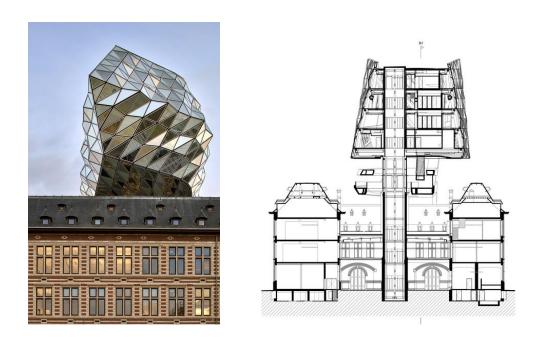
Facade elevation, photo courtesy of Hufton+Crow (left), Section drawing courtesy of Zaha Hadid Architects (right).
